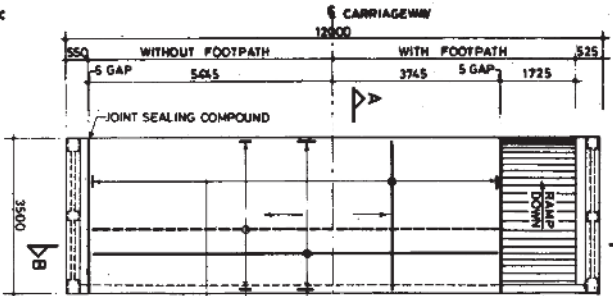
DETAILS OF PRECAST CONCRETE COVER FOR INSPECTION CHAMBER
